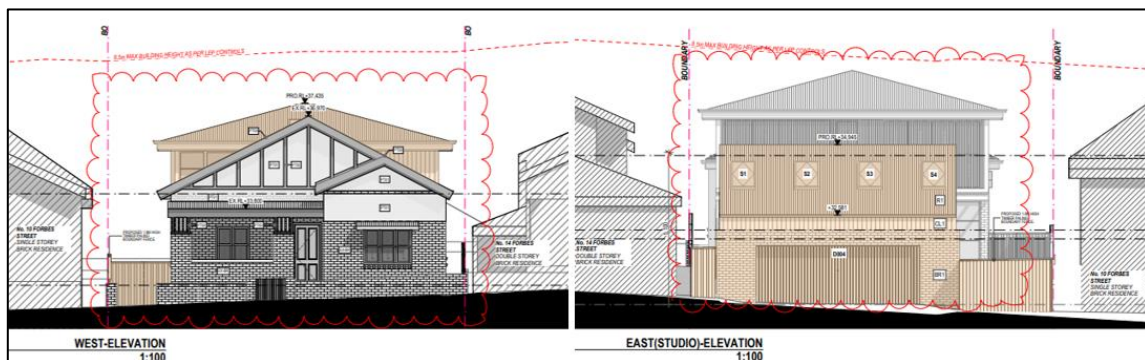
Amended Plans - Revision D (Subject of second Notification)
